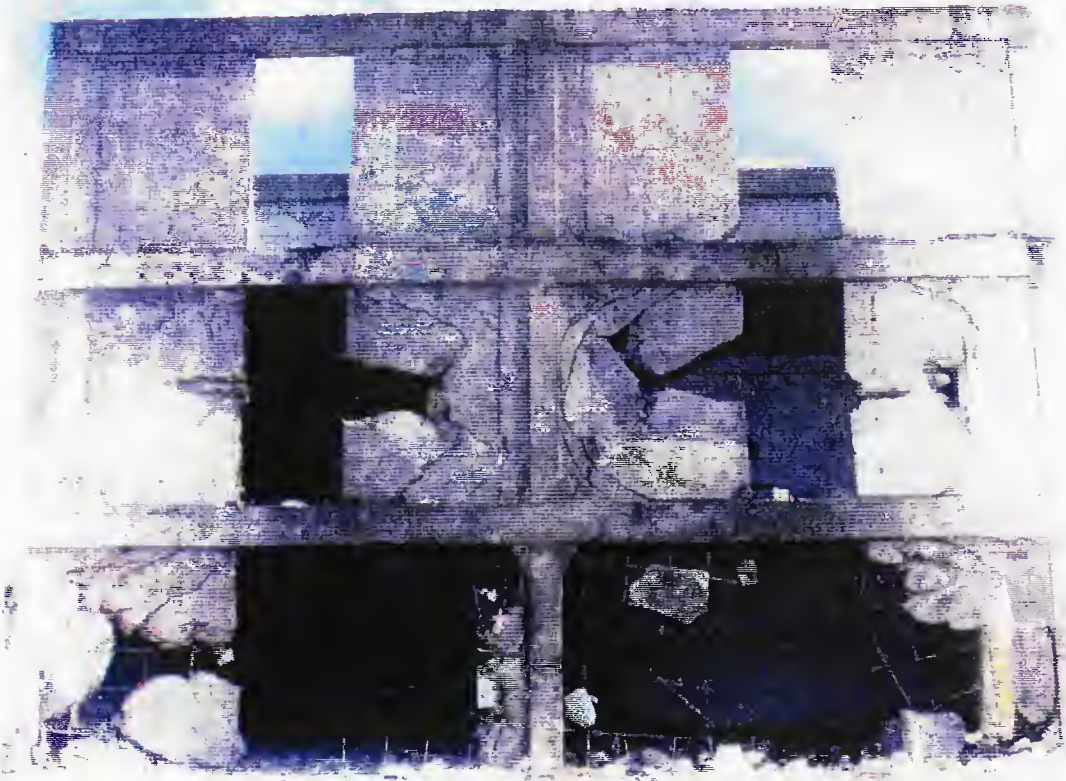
Damage Resulting from External Detonation of 830 lb TNT Equivalent
